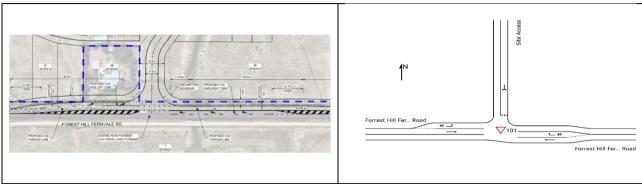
Concept Layout and SIDRA Layout - Forest Hill Fernvale Road / Site Access
